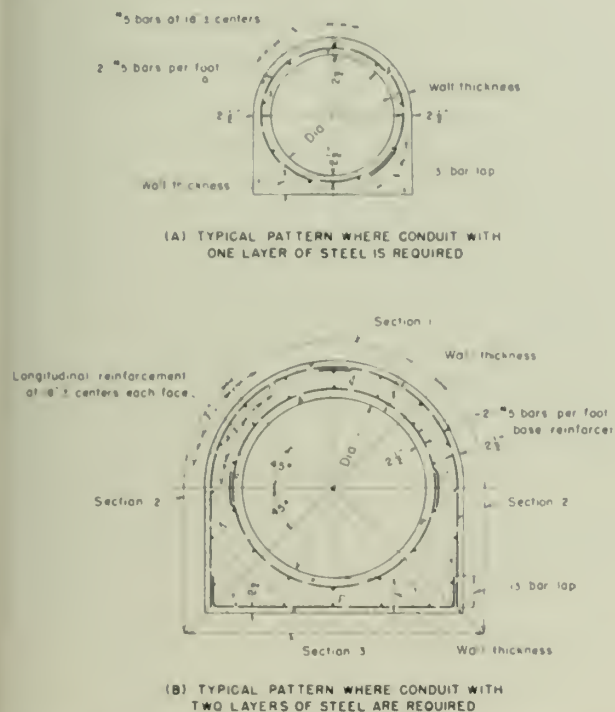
Typical reinforcement patterns for circular cast-in-place concrete conduits.
